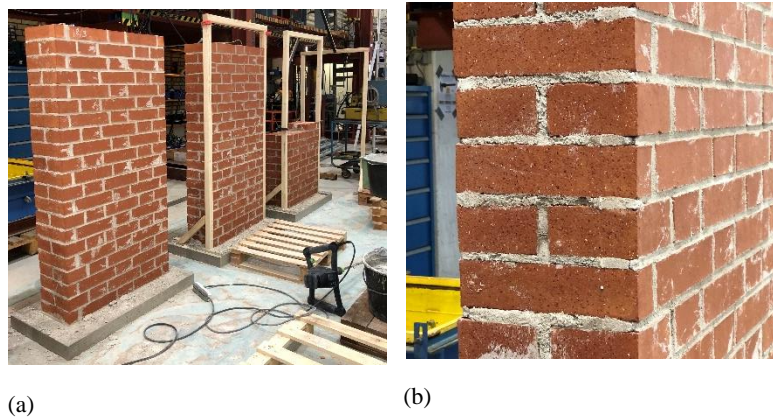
Picture of the test units under construction (a); side view of the brickwork (b) .
